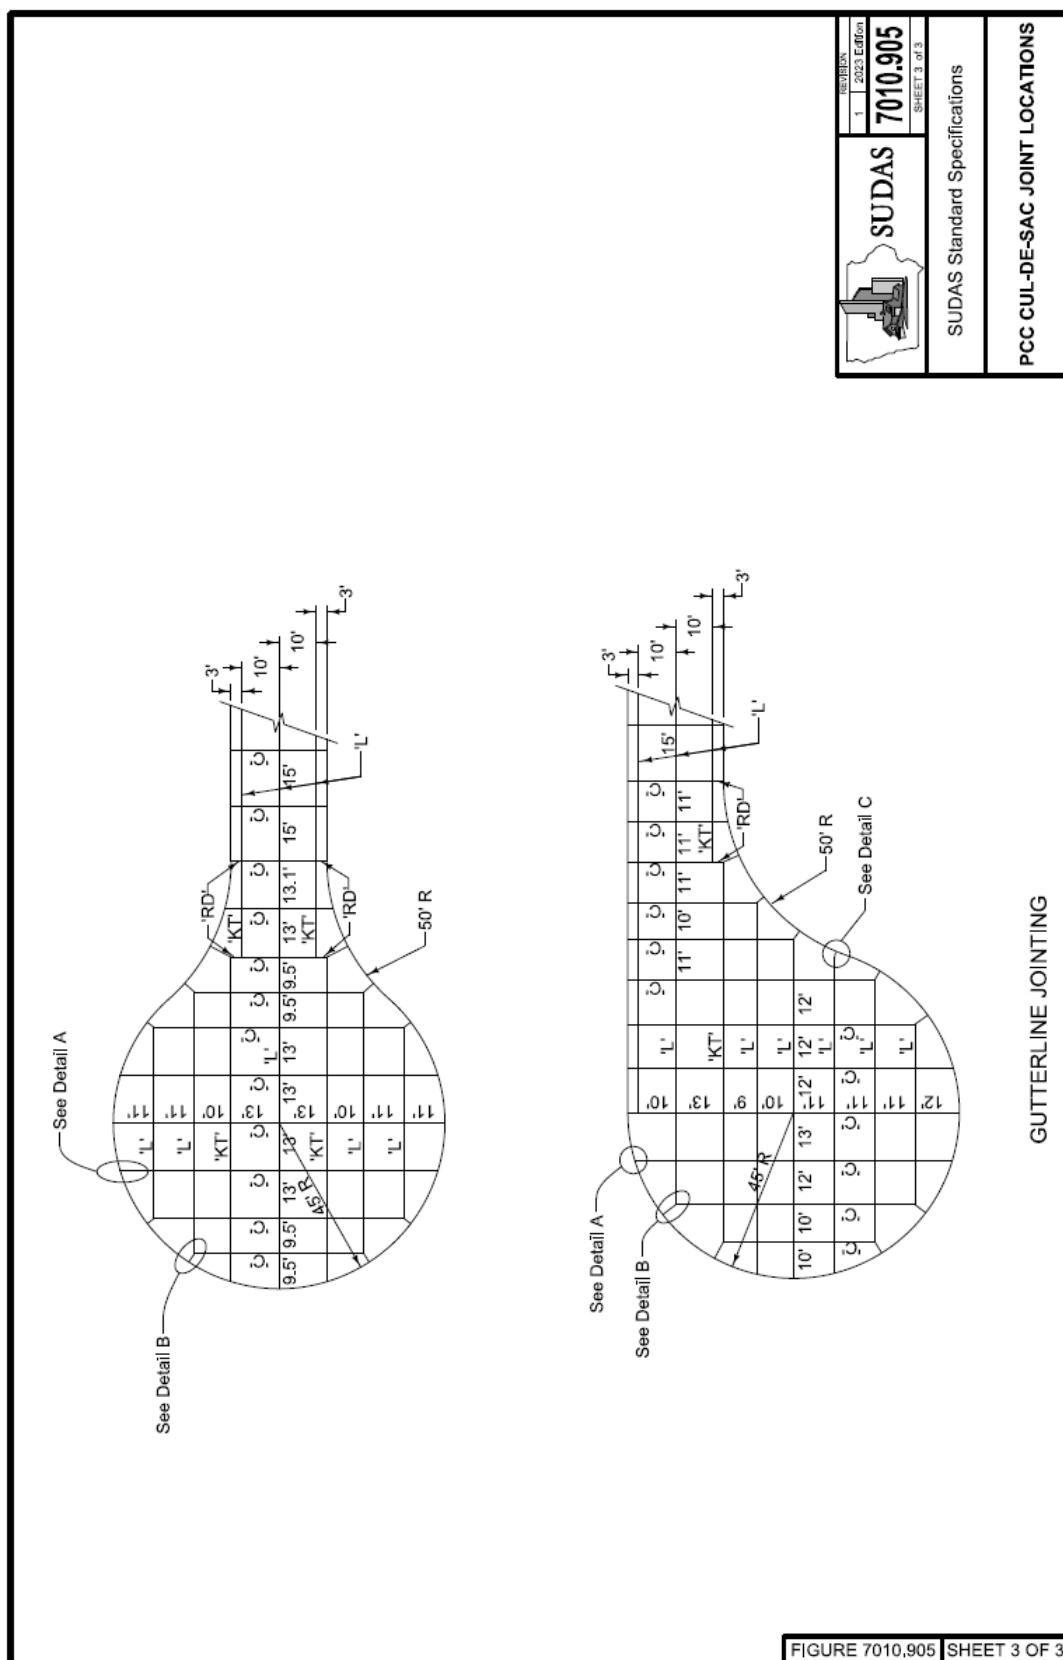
G-3.16: Cul-de-sac Joint Locations - Gutterline Jointing Examples
